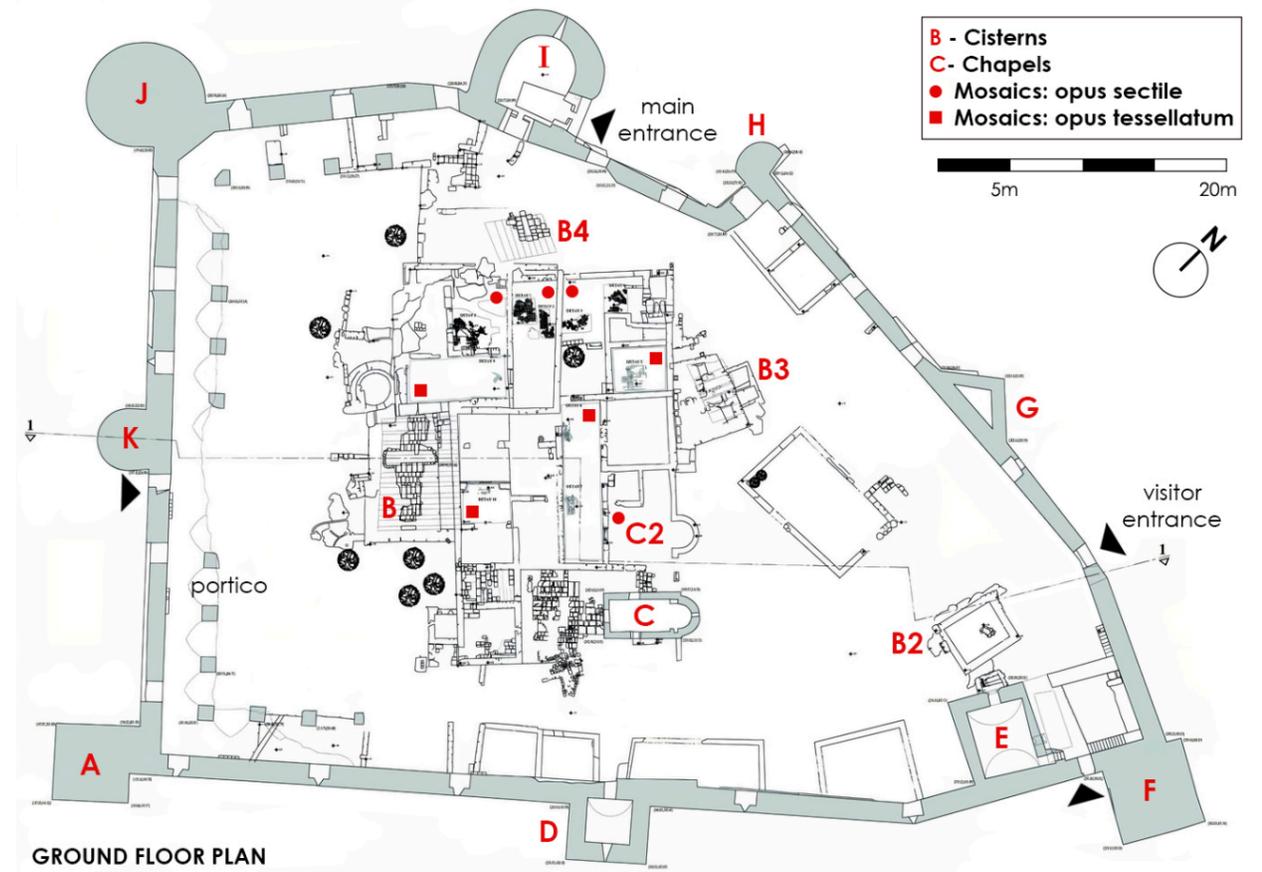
Ground floor plan of the castle (Source: Miyar Mimarlık Mühendislik, 2020)
